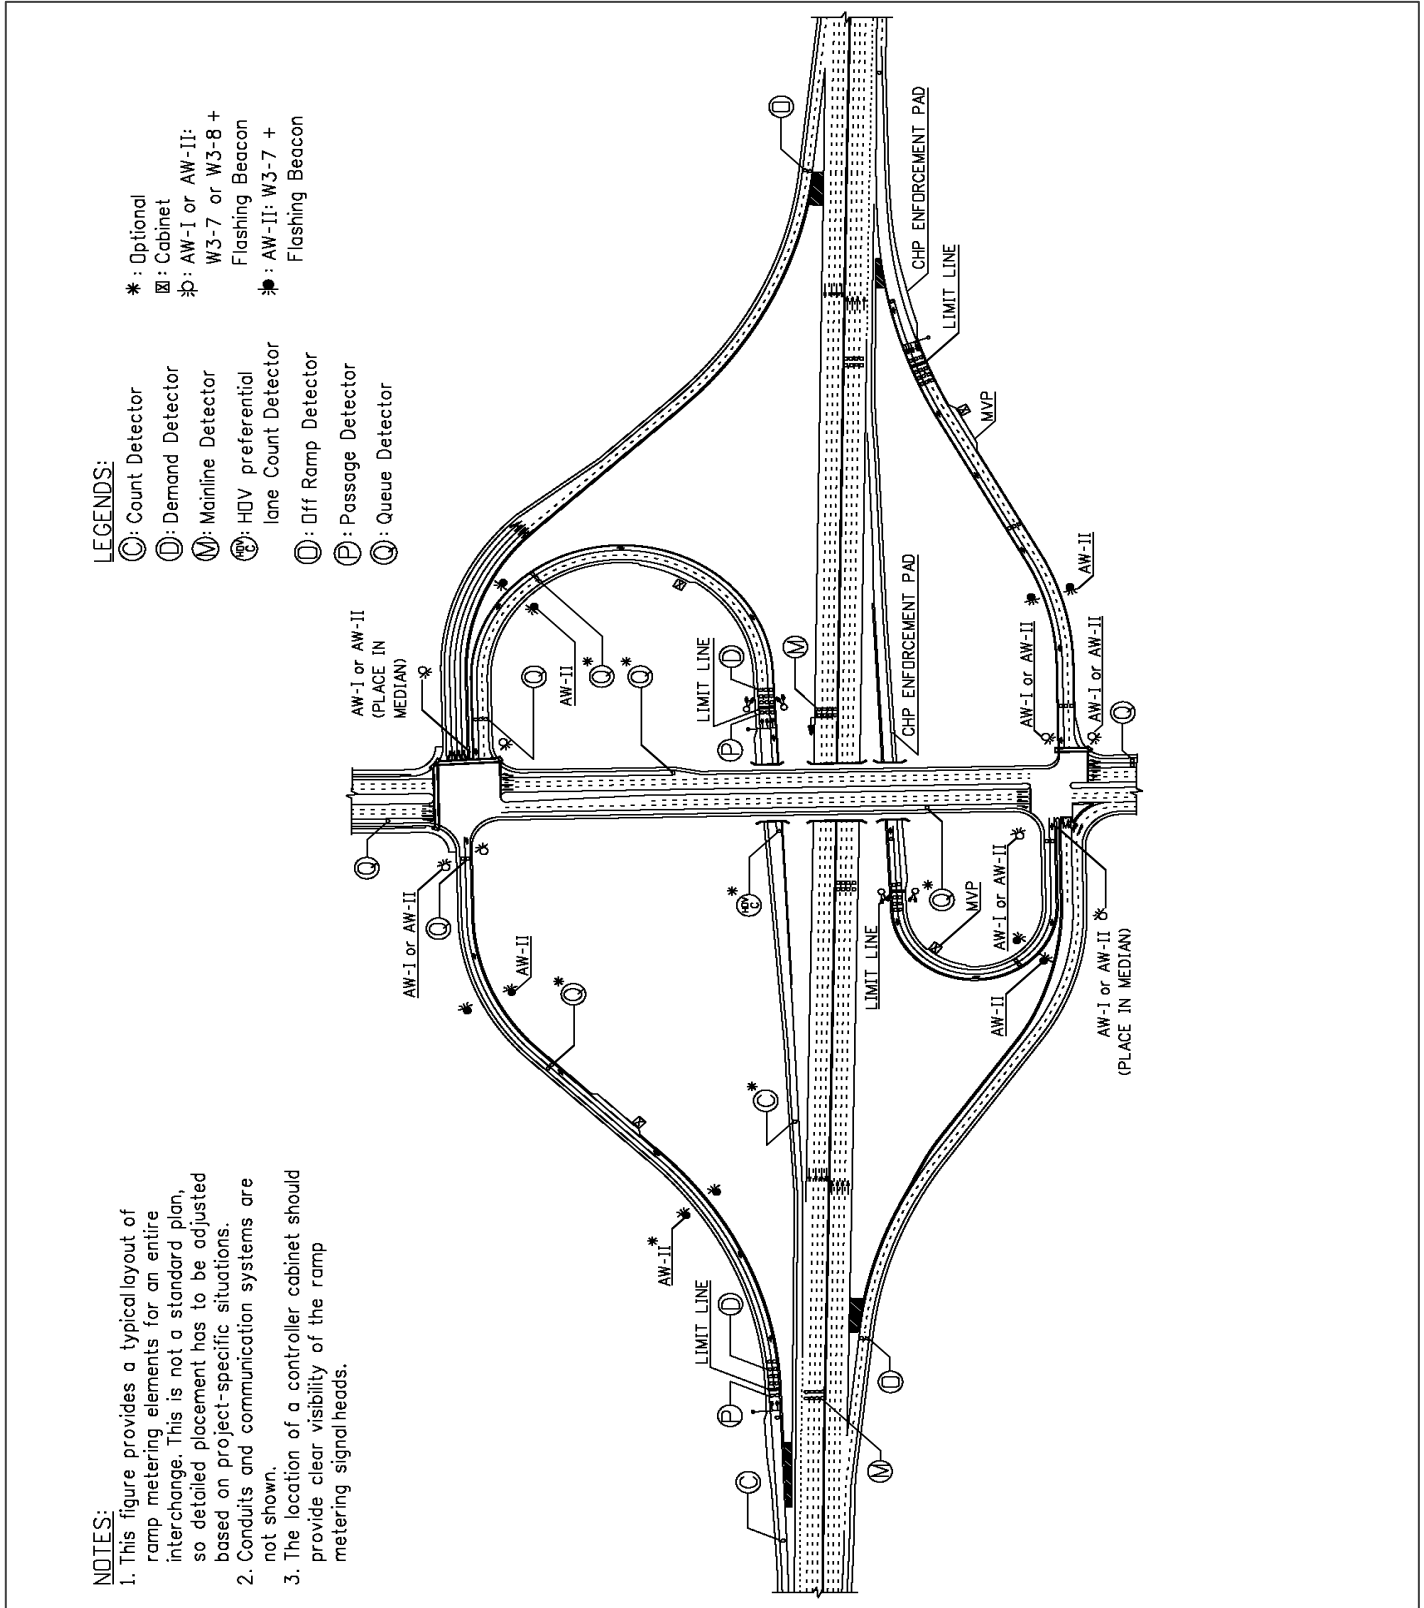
Typical Layout of Ramp Metering Elements at a Full-Cloverleaf Interchange
